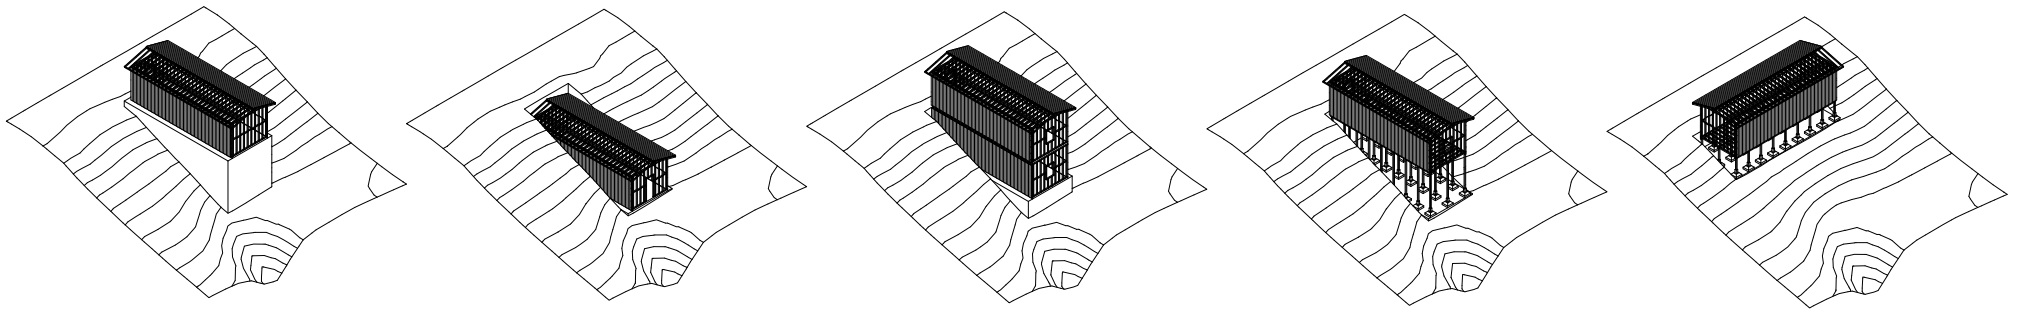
Adaptability of a light frame ADU on a hillside (left to right). 1) Concrete retaining walls over the slope. 2) Concrete retaining walls in the hillside. 3) Concrete platform and retaining walls with a second level. 4) Concrete retaining walls and base and post foundation system. 5) Concrete retaining walls and base and post foundation system rotating the ADU by the Author.
